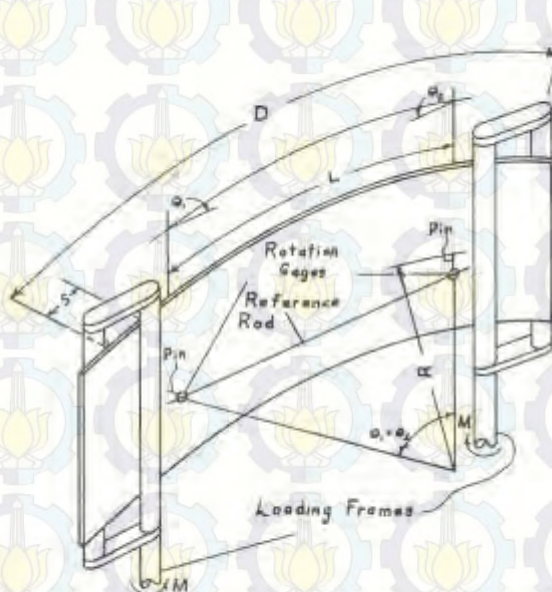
Pure Bending Test Showing Angular Rotation Gages and Loading Frames
